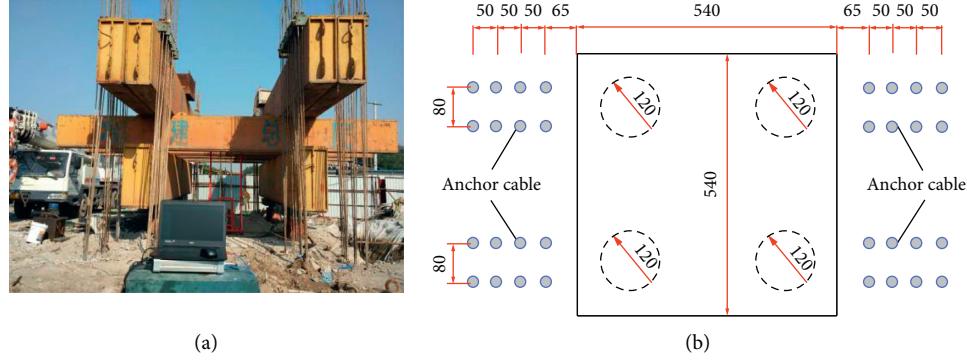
The loading test equipment (a) and the arrangement of anchor bolts around the cap (unit: cm) (b).
